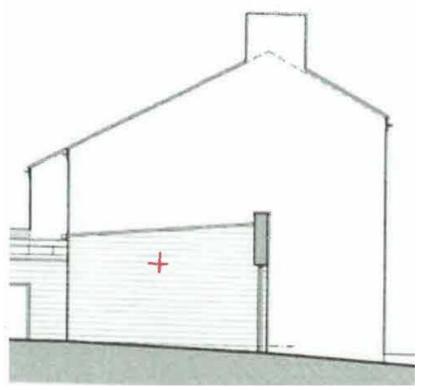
Existing side (northeast elevation) with markings of proposed fittings. The red crosses indicate the position of the proposed external lights to be installed 1.7m above ground level.
